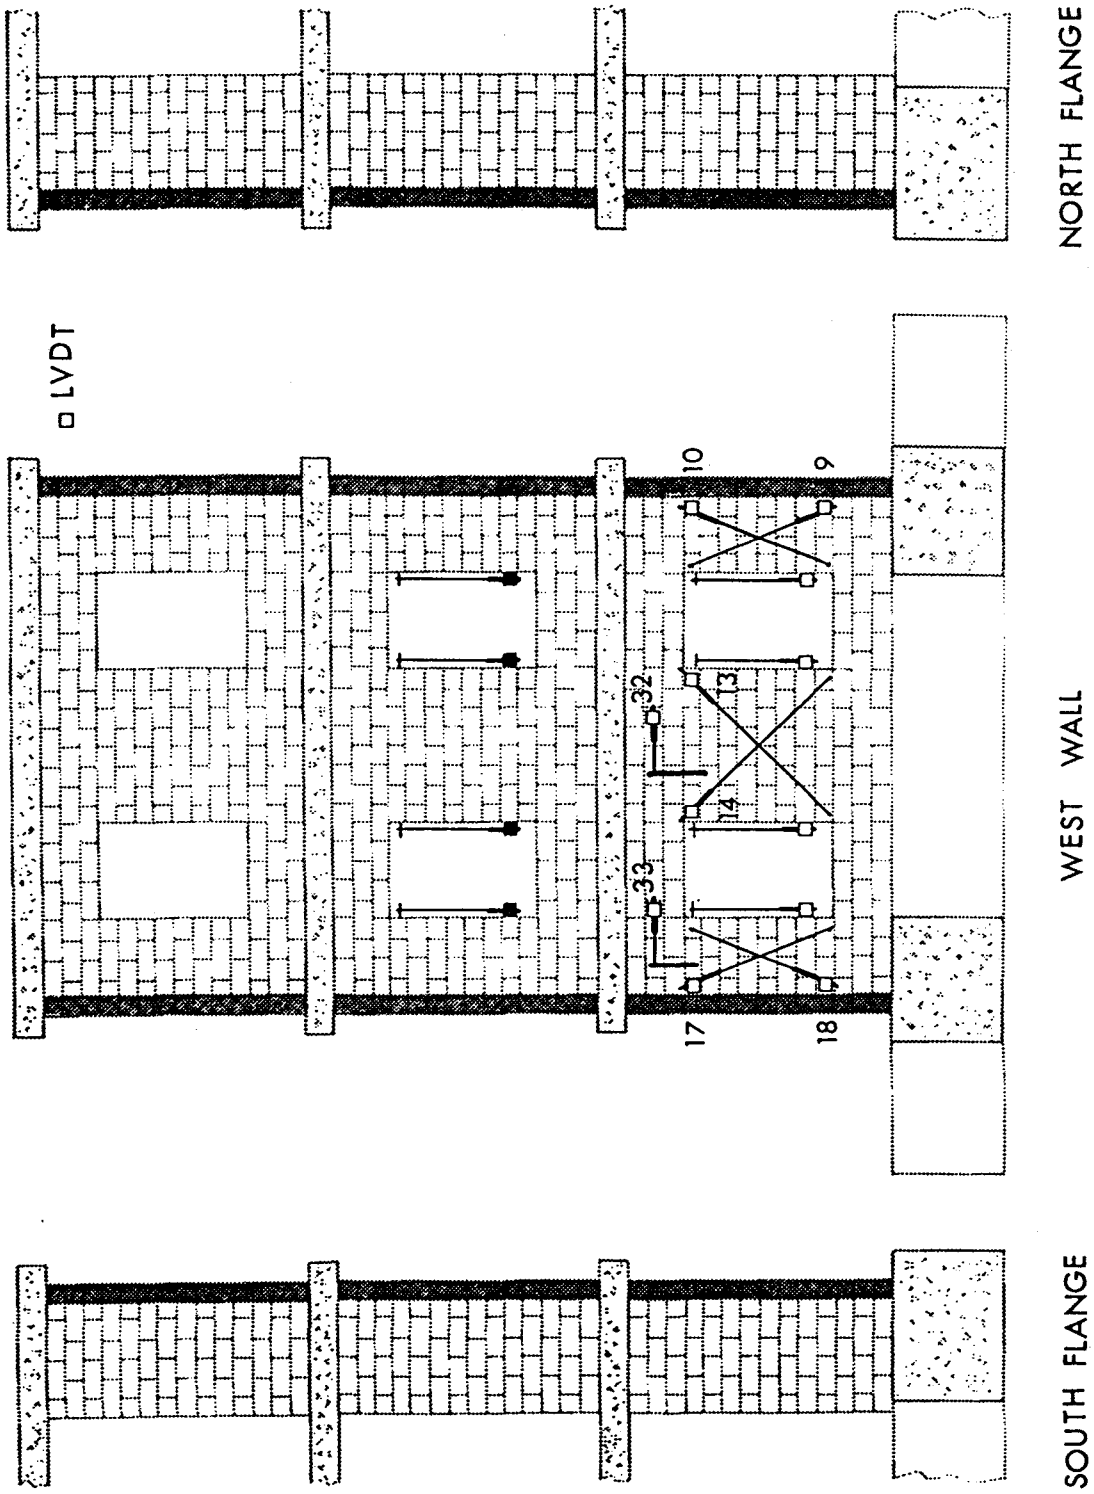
(cont) Layout of Instrumentation (RM2 - Static Test)
